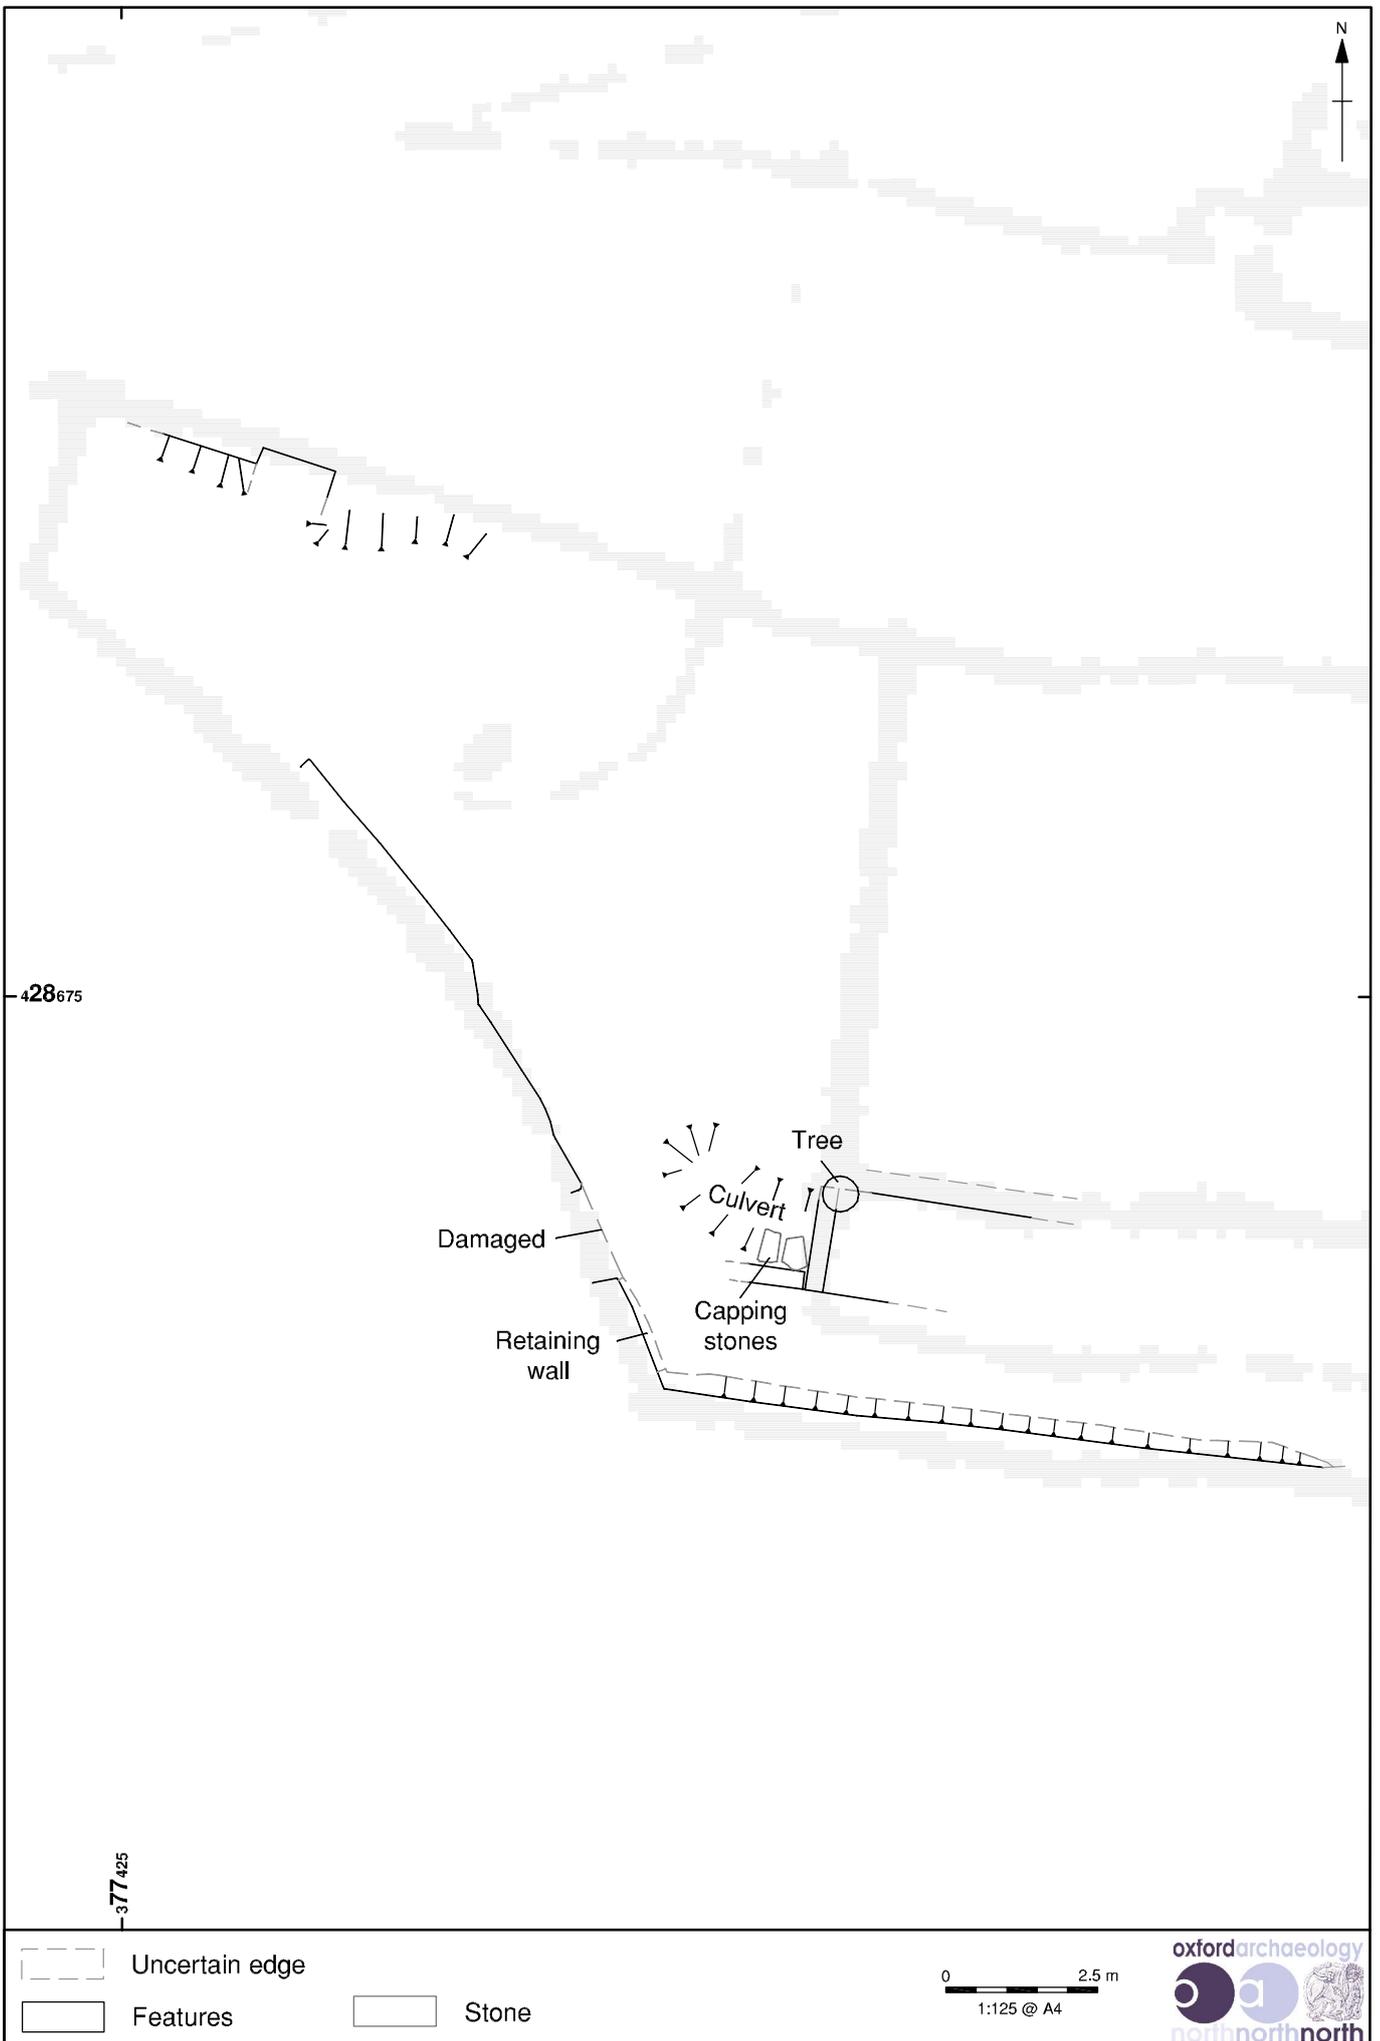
Detail of retaining wall and culvert, overlain onto the Ordnance Survey map of 1893
